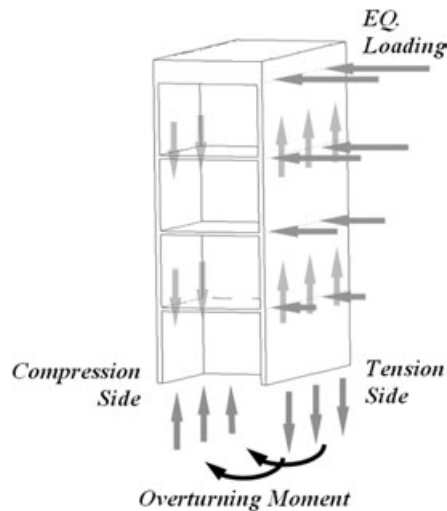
Initiation of global tension–compression (T/C) force couple in a typical H-shape tunnel form section
